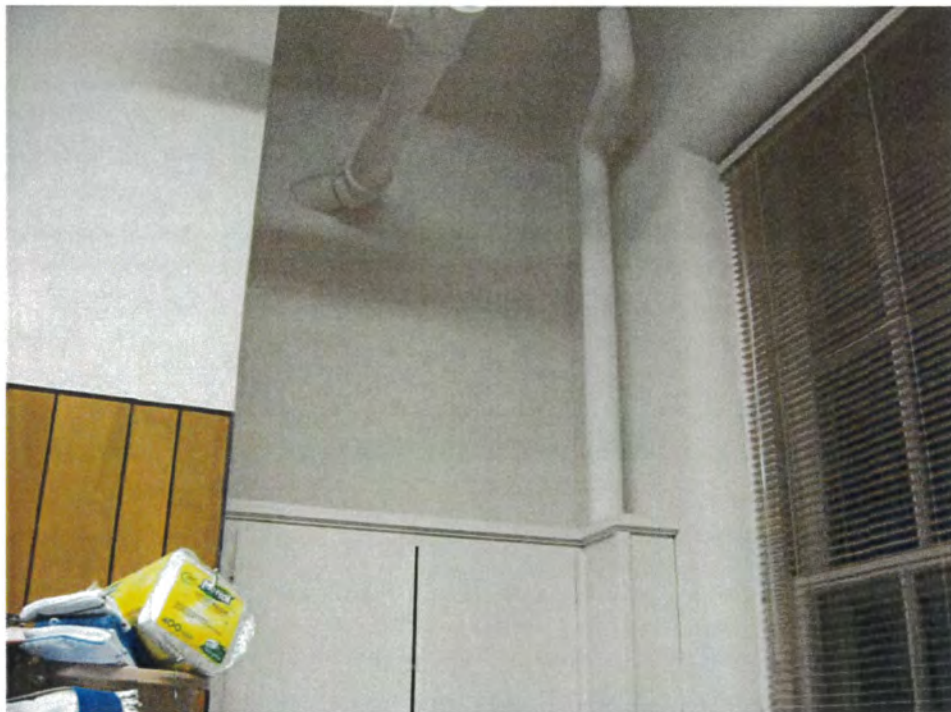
First floor, kitchen. View facing W, showing exposed insulation.
